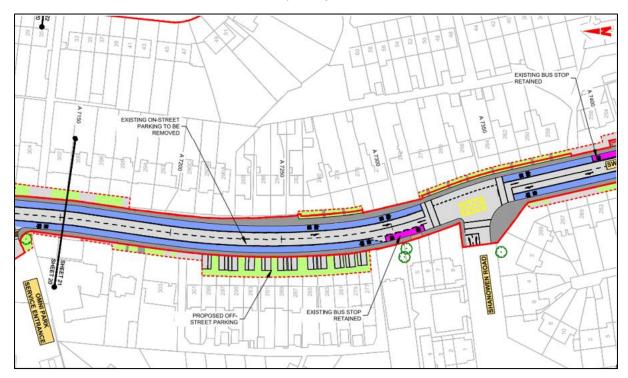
Proposed General Arrangement in between Omni Park Shopping Centre and Shanowen Road (Sheet 21)
